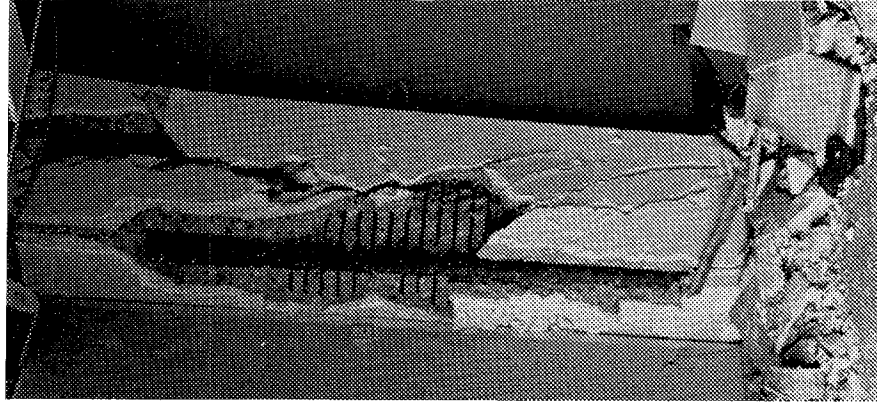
STRUCTURAL DAMAGE TO FRAME 29 IN FIRST STORY
